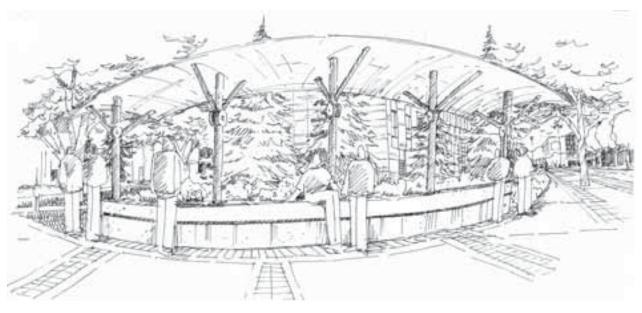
Conceptual sketch of north-west corner of 87 Avenue and 112 Street
